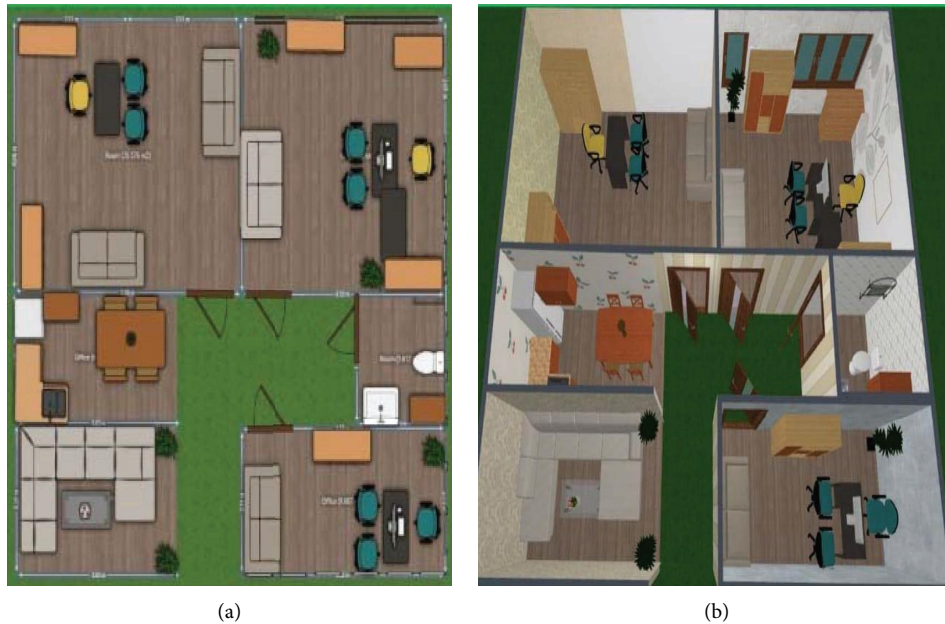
Design of a prototype using the Coohom tool. (a) Top view of 2D layout and (b) top view of 3D layout.
